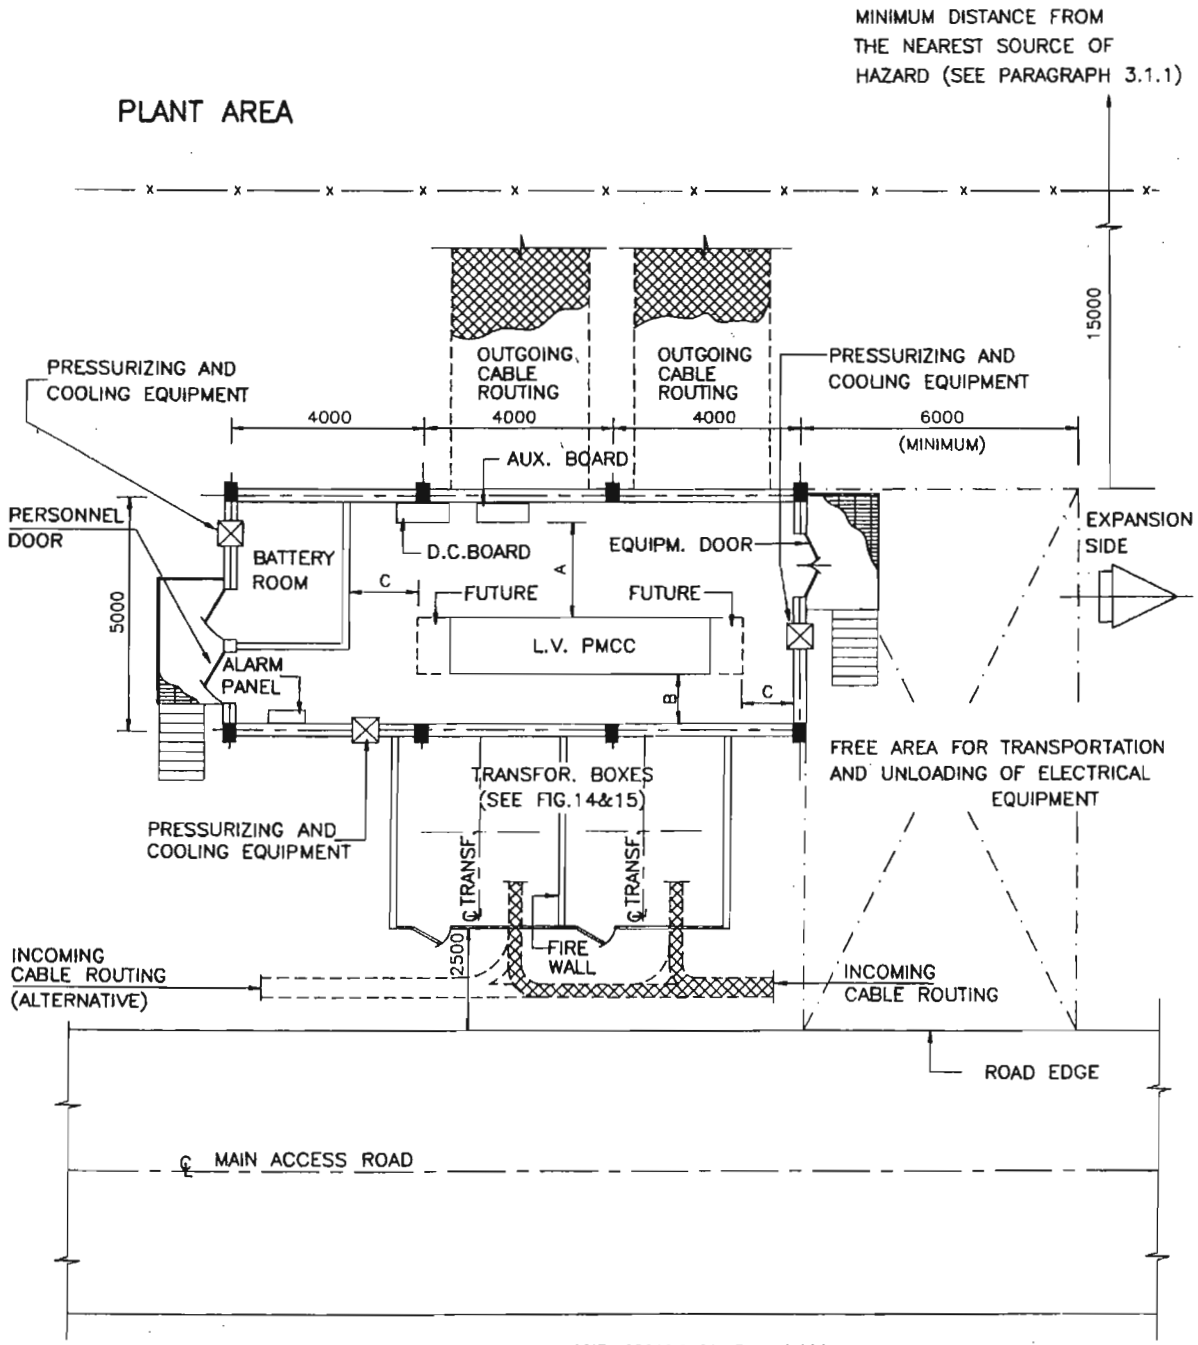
LAYOUT—L.V. DOUBLE ENDED SUBSTATION
